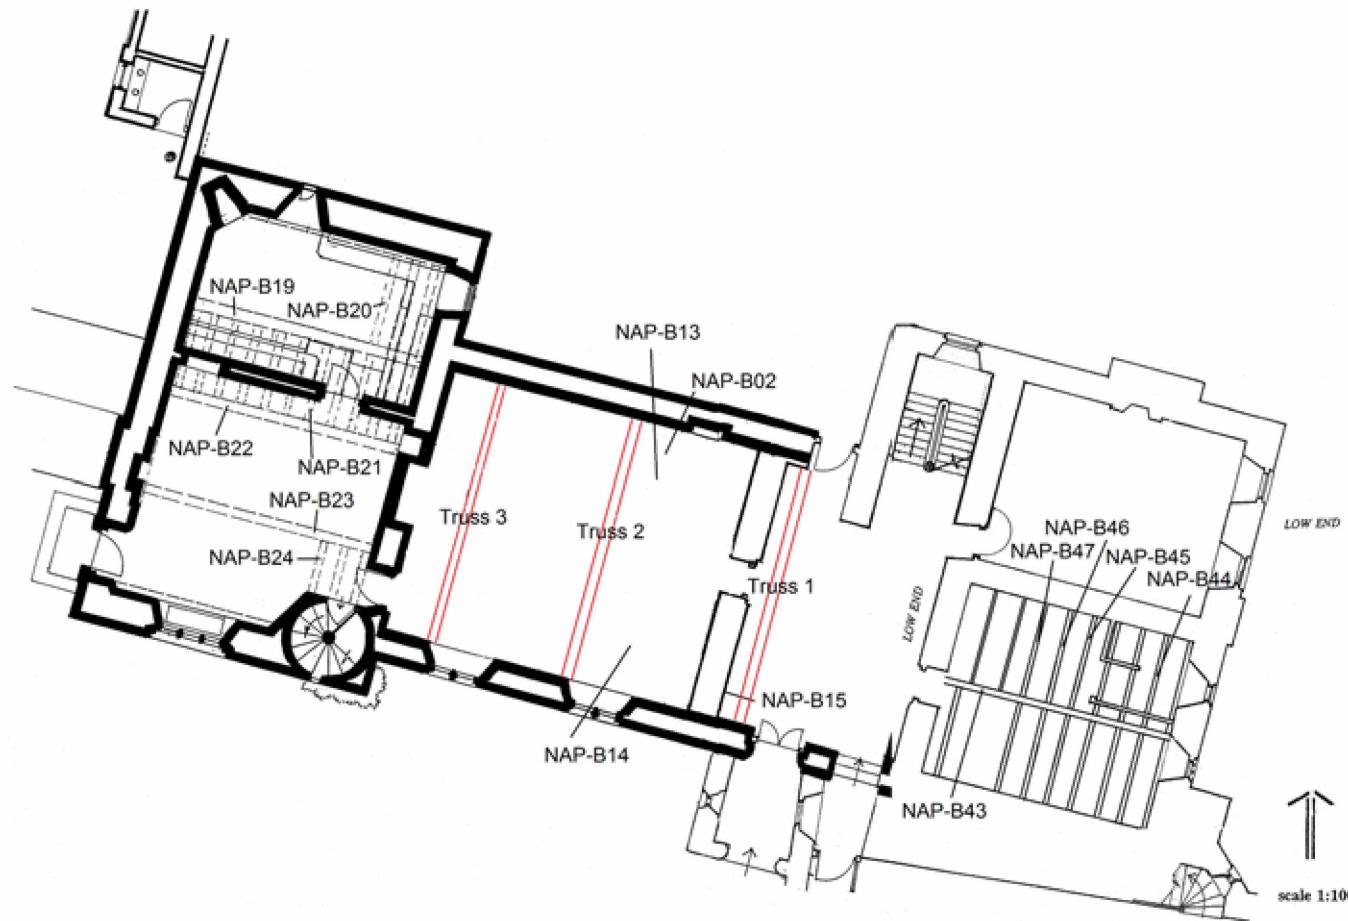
North range, ground-floor plan showing the location of samples NAP-B02, NAP-B13–15, NAP-B19–24, and NAP-B43–47 (John Warren)
